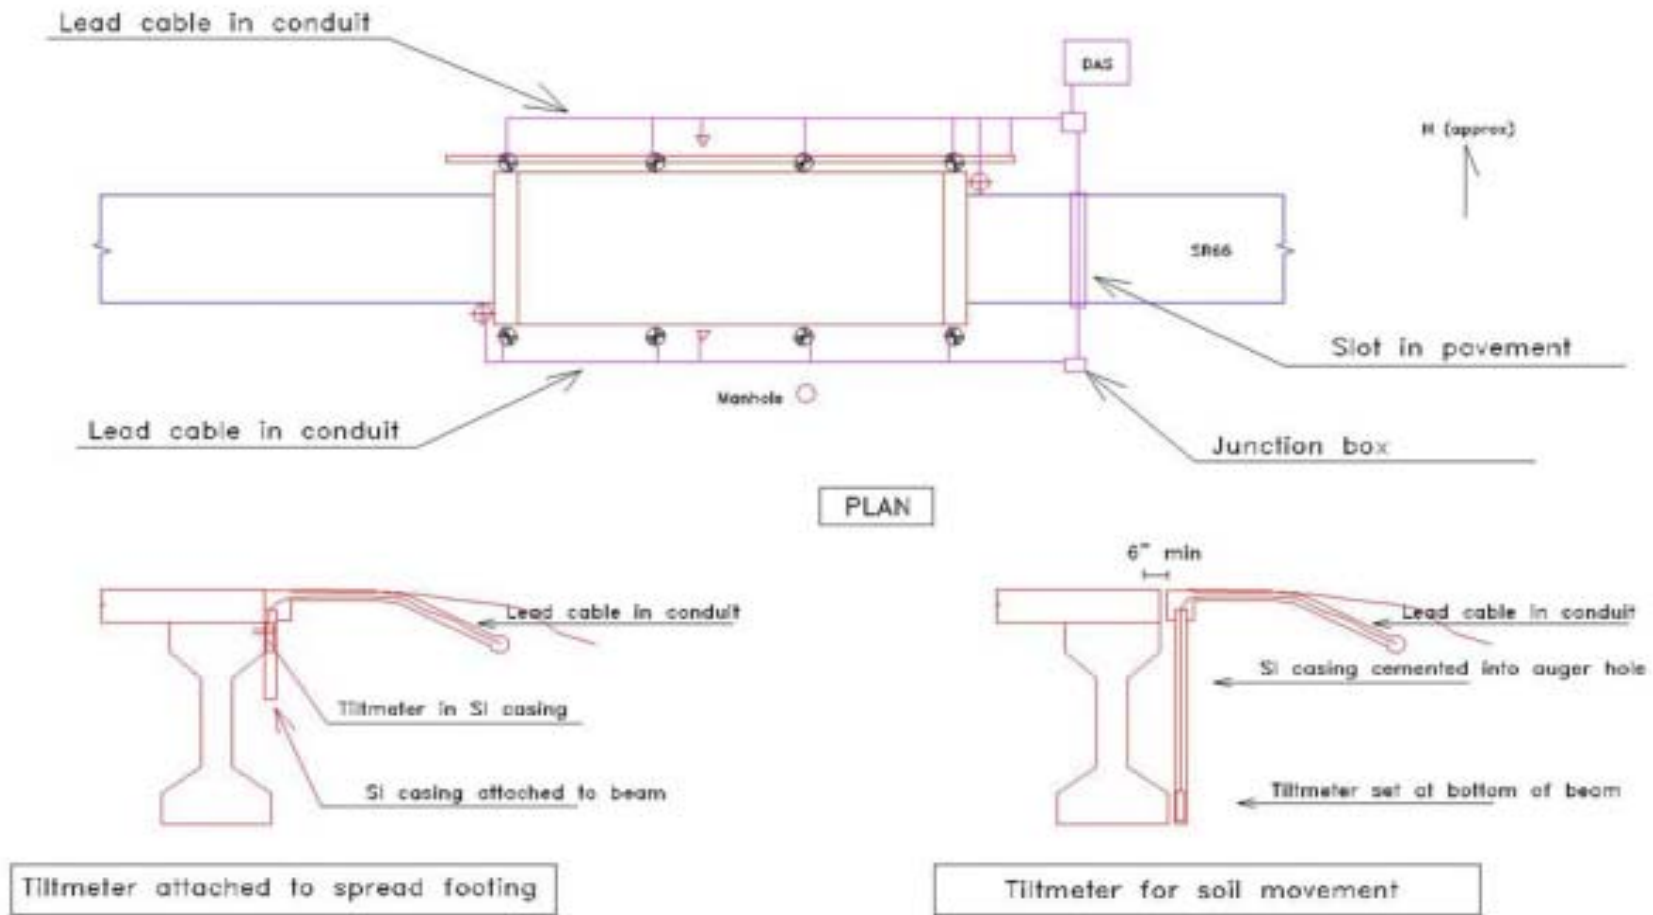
Plan view of the lead cable system and cross section of the tiltmeters at S.R. 66, Highland county, Florida.
